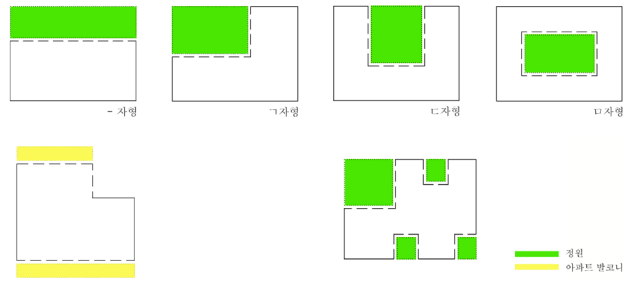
The Diagram of House Types in Pangyo (-Shape, ㄱShape, ㄷShape, ㅁShape), The Plan of Apartment House and P House
